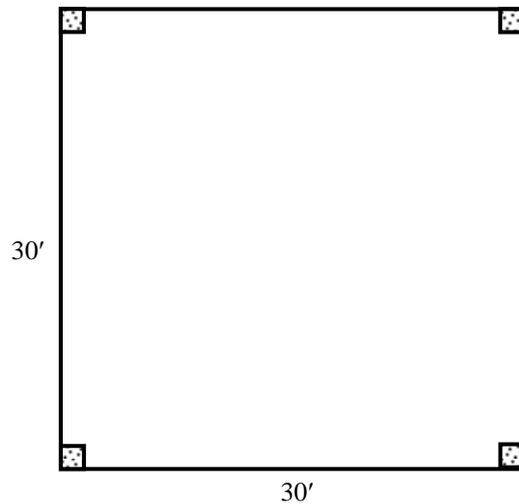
Plan of 6-, 12 and 24-storied buildings
